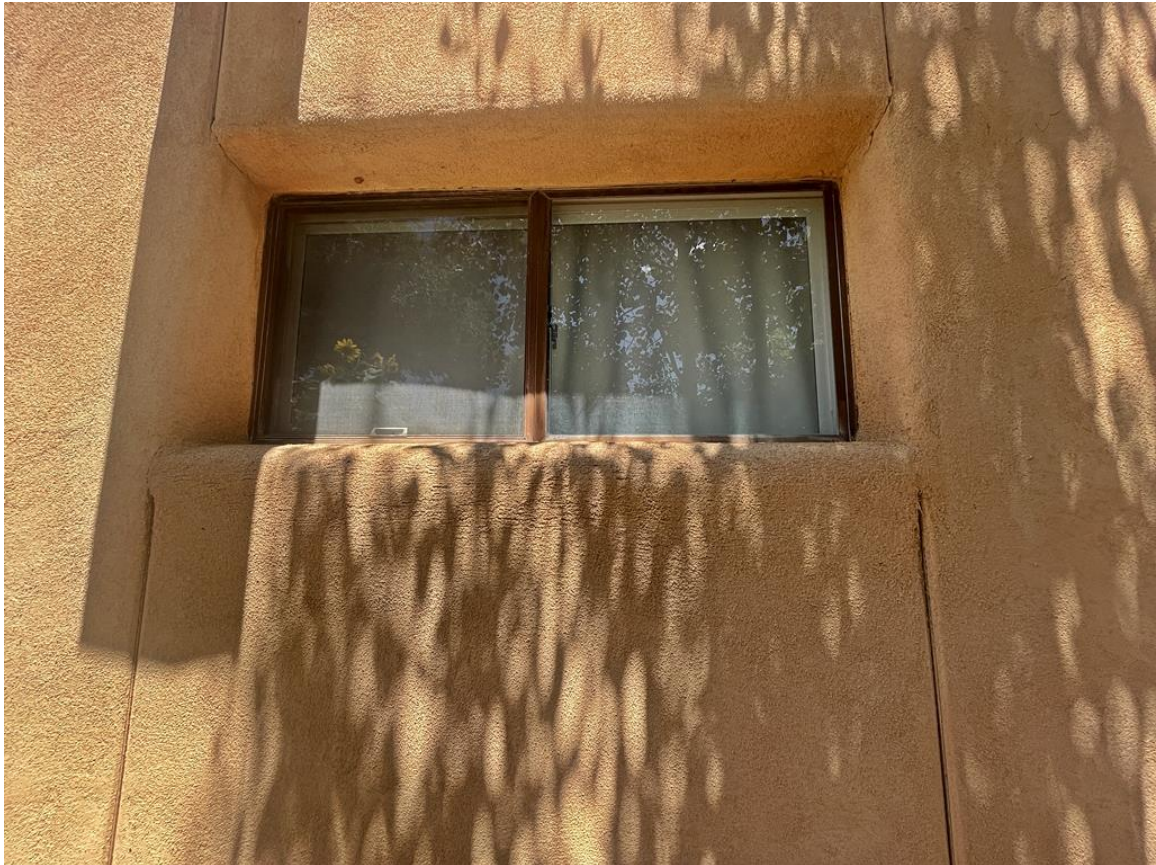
South elevation. Privacy window at primary bedroom addition. Camera facing north.
